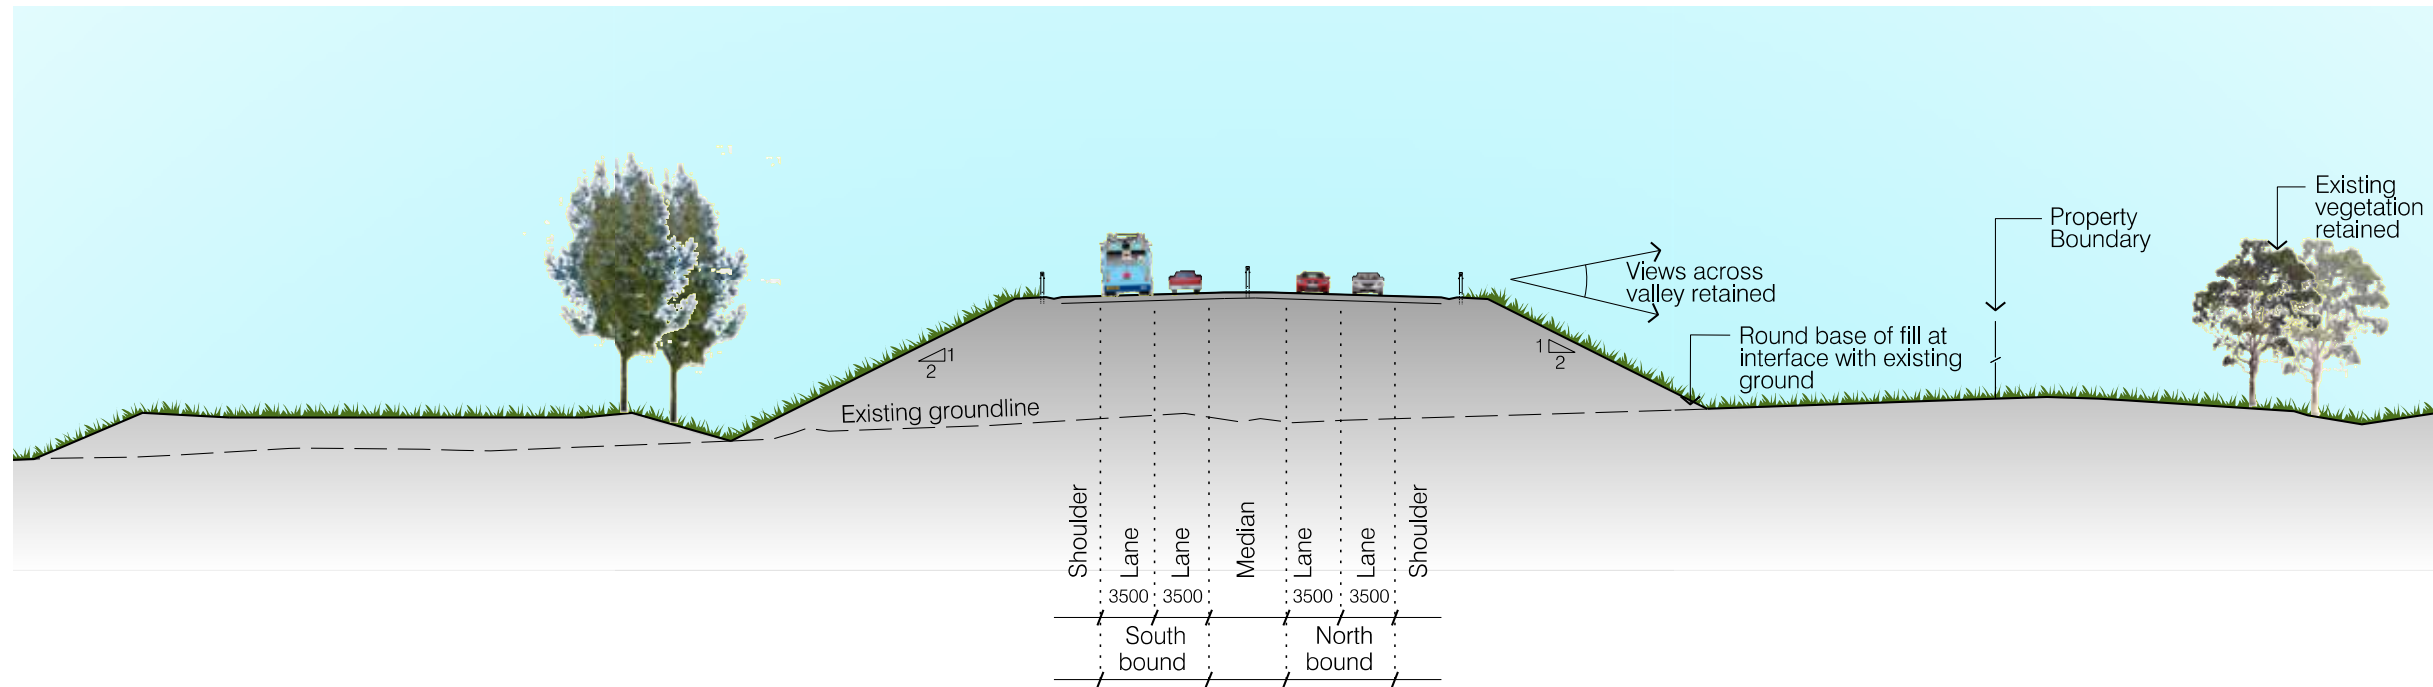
Road cross section at Ch. 12700 (Scale 1:500 @ A3)
